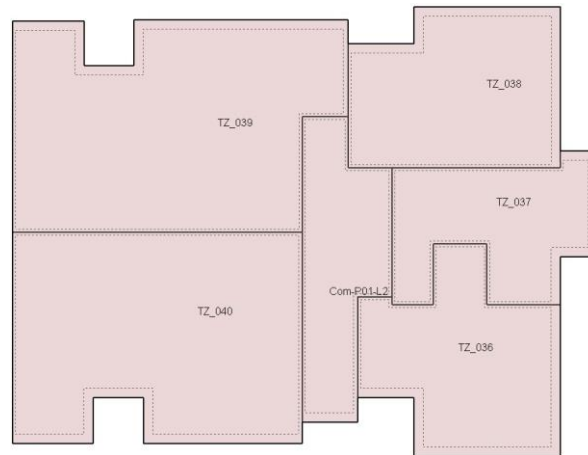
Thermal zone definition on floor 1 (6D L2 building of the Stepa Stepanovic neighborhood)
